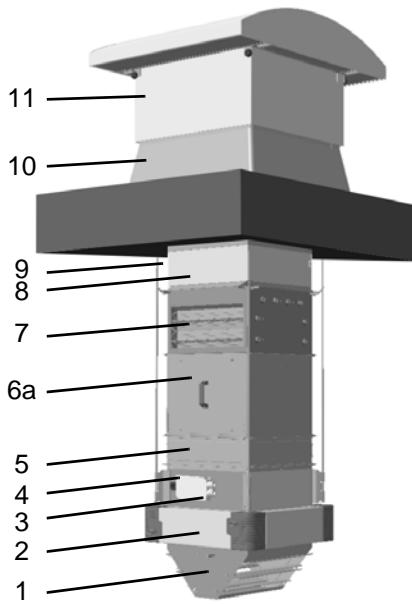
a: Sample Ceiling mounting, heater with secondary-air louvre
